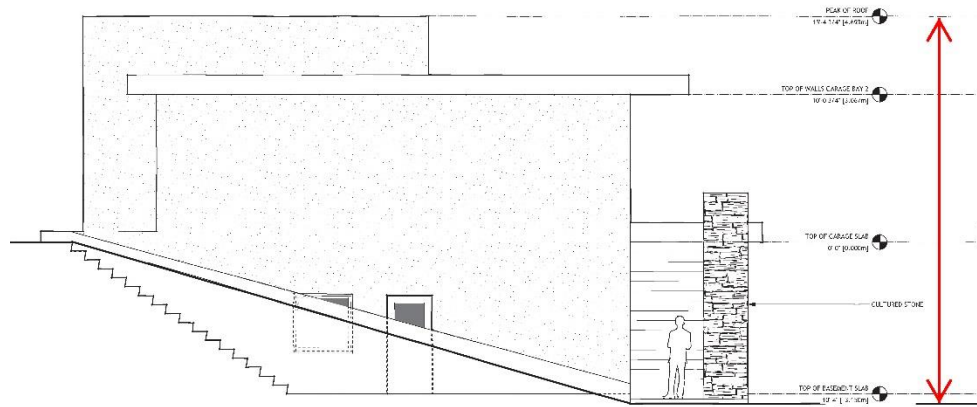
Cross Section of Proposed Carriage House showing where the 8.05m height measurement is taken; on the walkout side.
